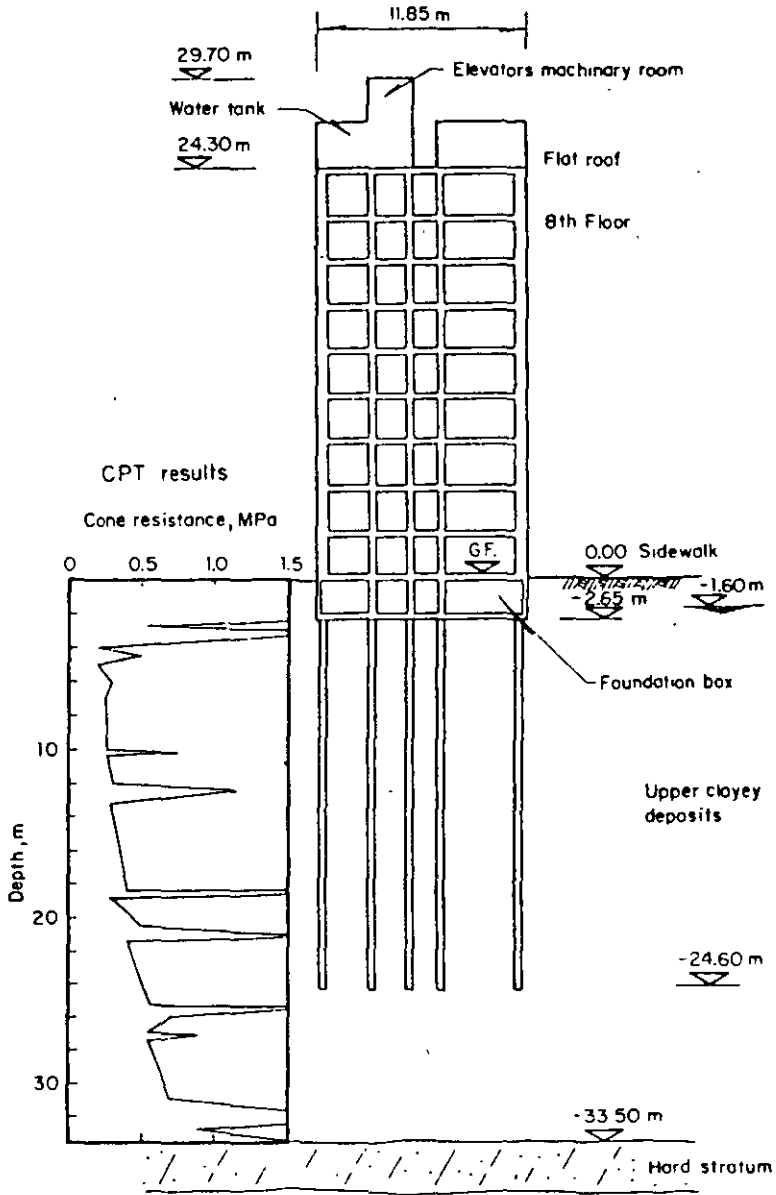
Elevation of the Building V including foundation and geotechnical conditions.
